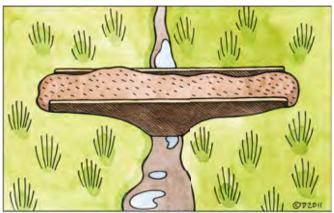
Dams made of plywood can be used to block shallower ditches. Board should be sawn to sizes with greater length and depth than the ditch. To put them in place grooves can be cut in the peat using a long-reach motor-saw. The boards can then be hammered into place e.g. with a sledgehammer. Peat should then be shovelled in between the boards and packed tightly. ILLUSTRATIONS: TUPU VUORINEN.
